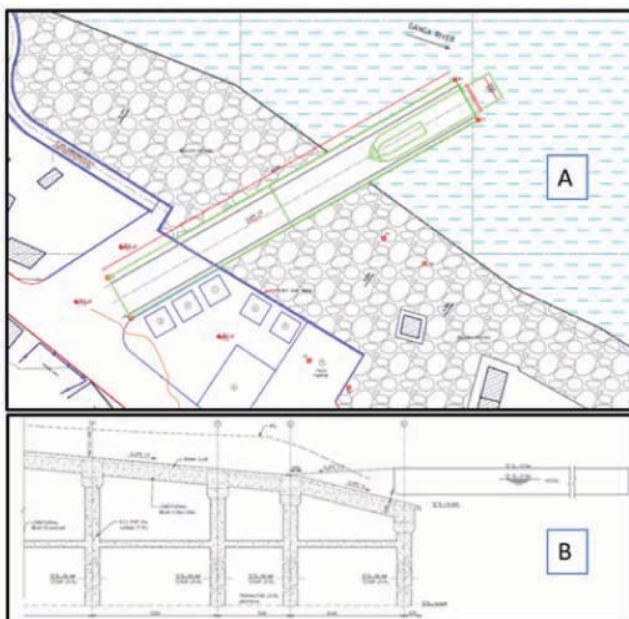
Schematic plan (A) and sectional view (B) of the RO-RO ramp at Sahibganj
